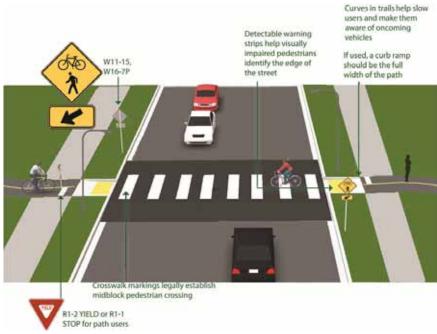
H – Mid-block non-signalized trail crossing of a local/residential street.
